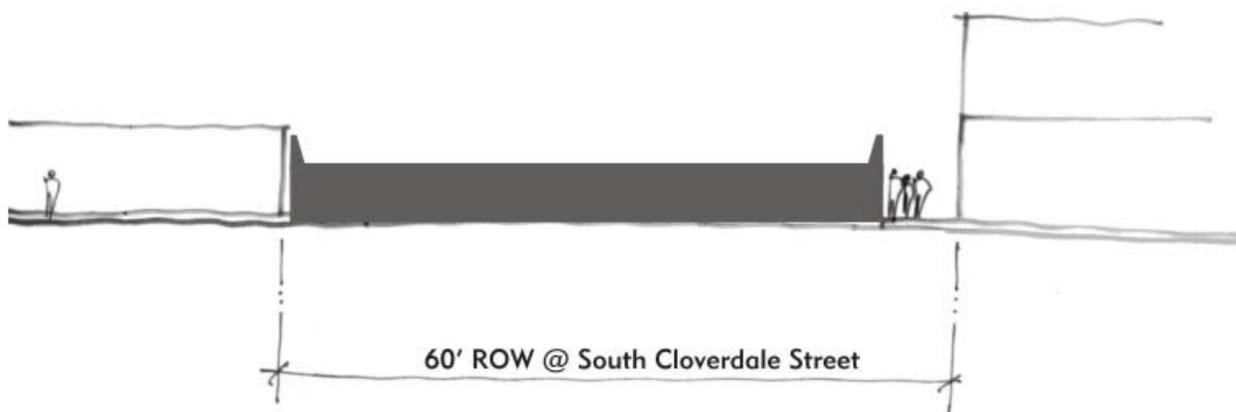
Mid-Level Fixed-Span Bridge Alternative at S. Cloverdale Street
